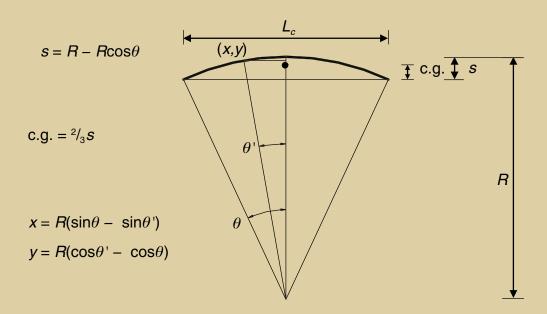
This drawing illustrates the plan view of a horizontally curved girder. c.g. = center of gravity.
